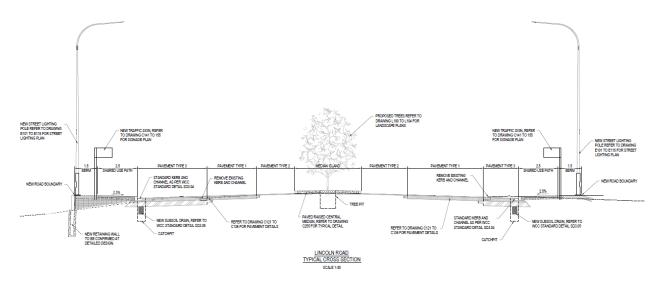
Extract from GHD Preliminary Design Drawing 51-30961-C116 showing a typical cross section for Lincoln Road.
